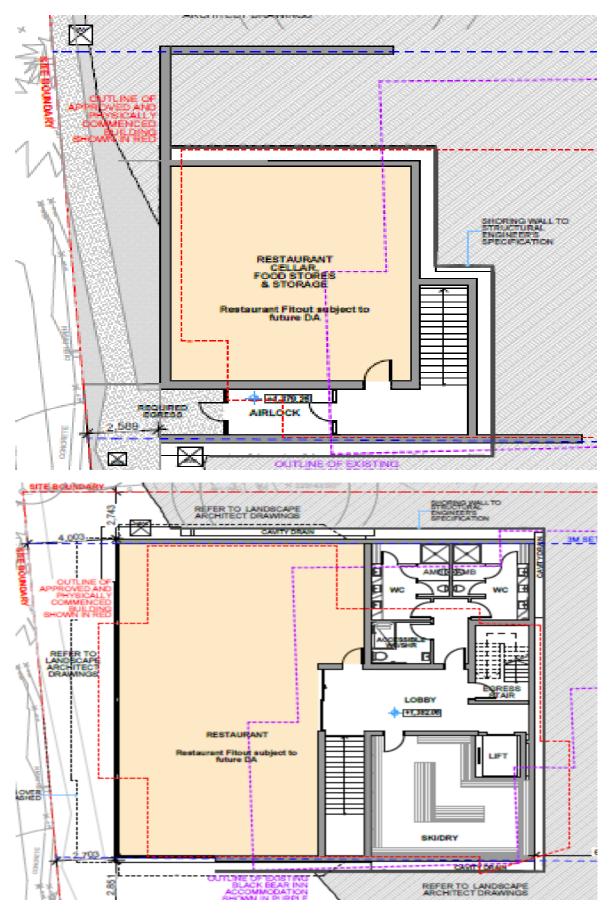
| Approved basement and Level 1 plan (Source: NSW LEC approval)
